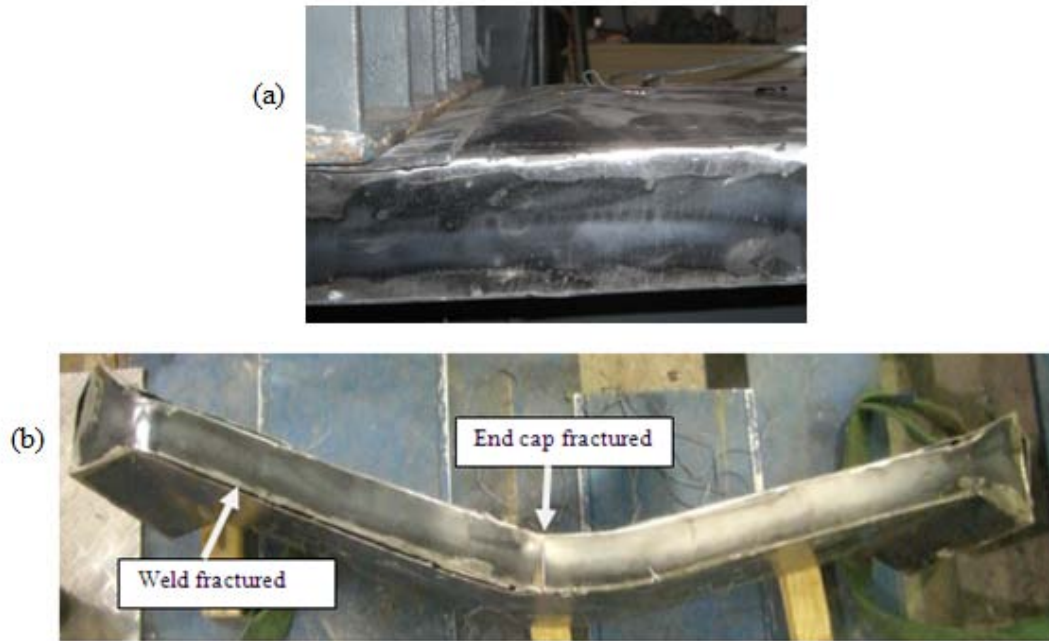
Deformation observed in the Fully enclosed panel, (a) buckling of top faceplate adjacent to the loading point, (b) fracture of the end cap and failure of weld between the end cap and steel faceplates.
